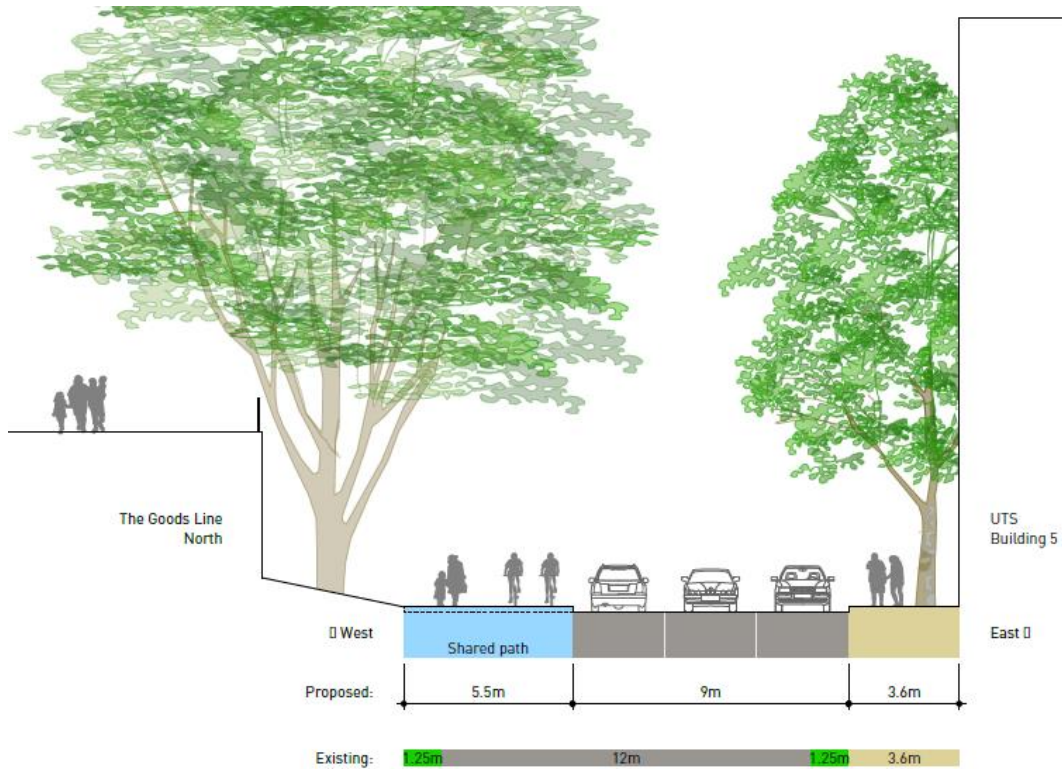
Proposed Darling Drive cross section north of Ultimo Road
